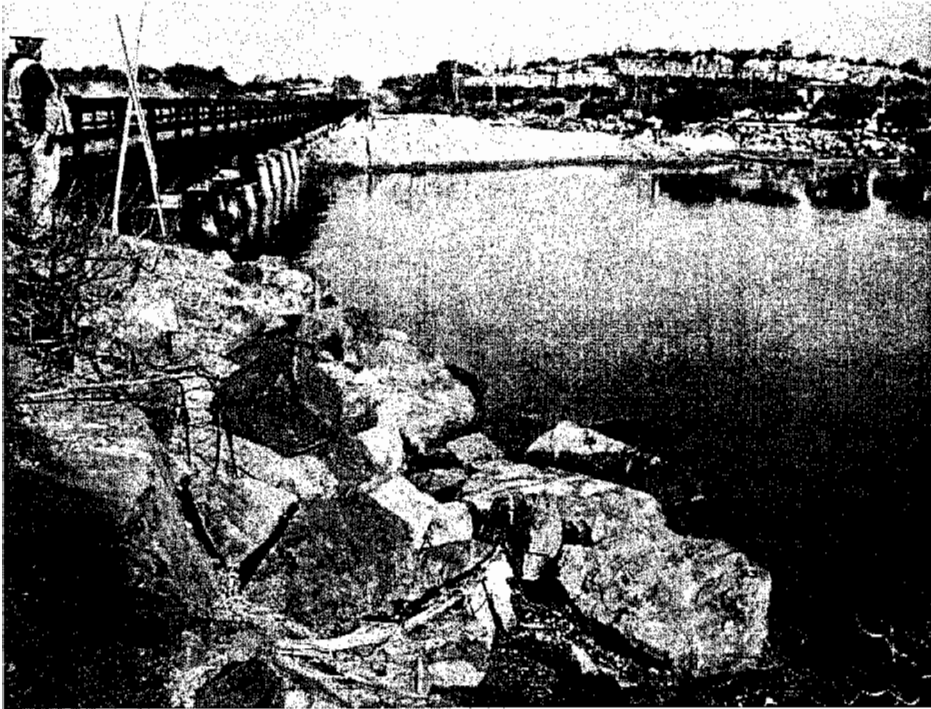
Bridge 243.0 Looking Upstream cast towards bridge
